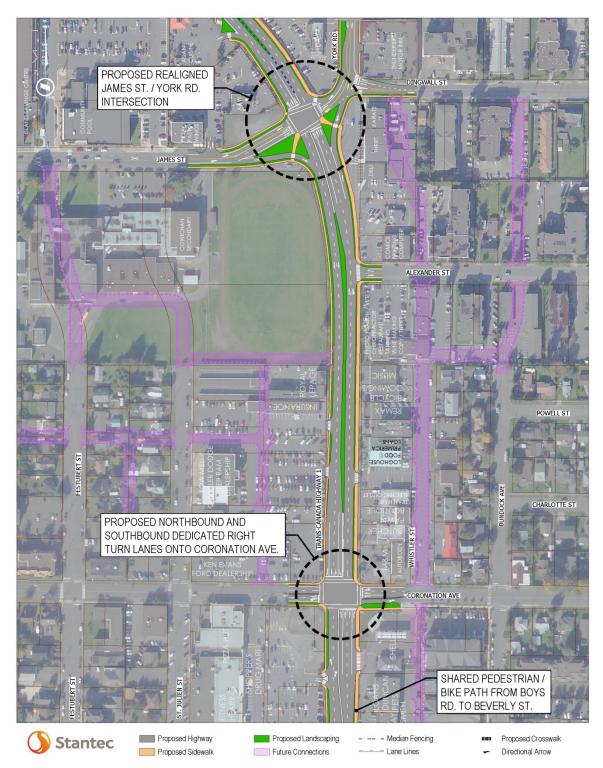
Long Term Transportation Plan–Trunk Road to James St/York Rd
